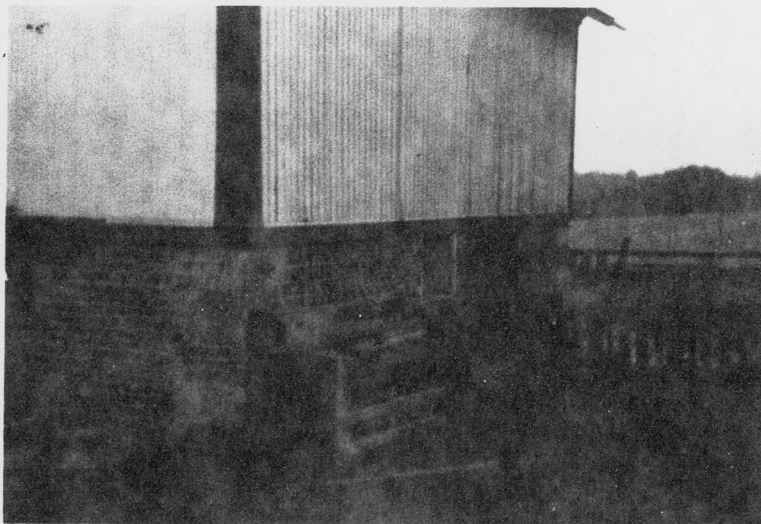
and #9 of the Eliza Jones home on West Henrietta Road, built in 1863, illustrate the use of cobblestone facing on the foundations of many homes. In #8 ~~the foundation under~~ the two wings were added about fifty years later, and the foundations were built by
